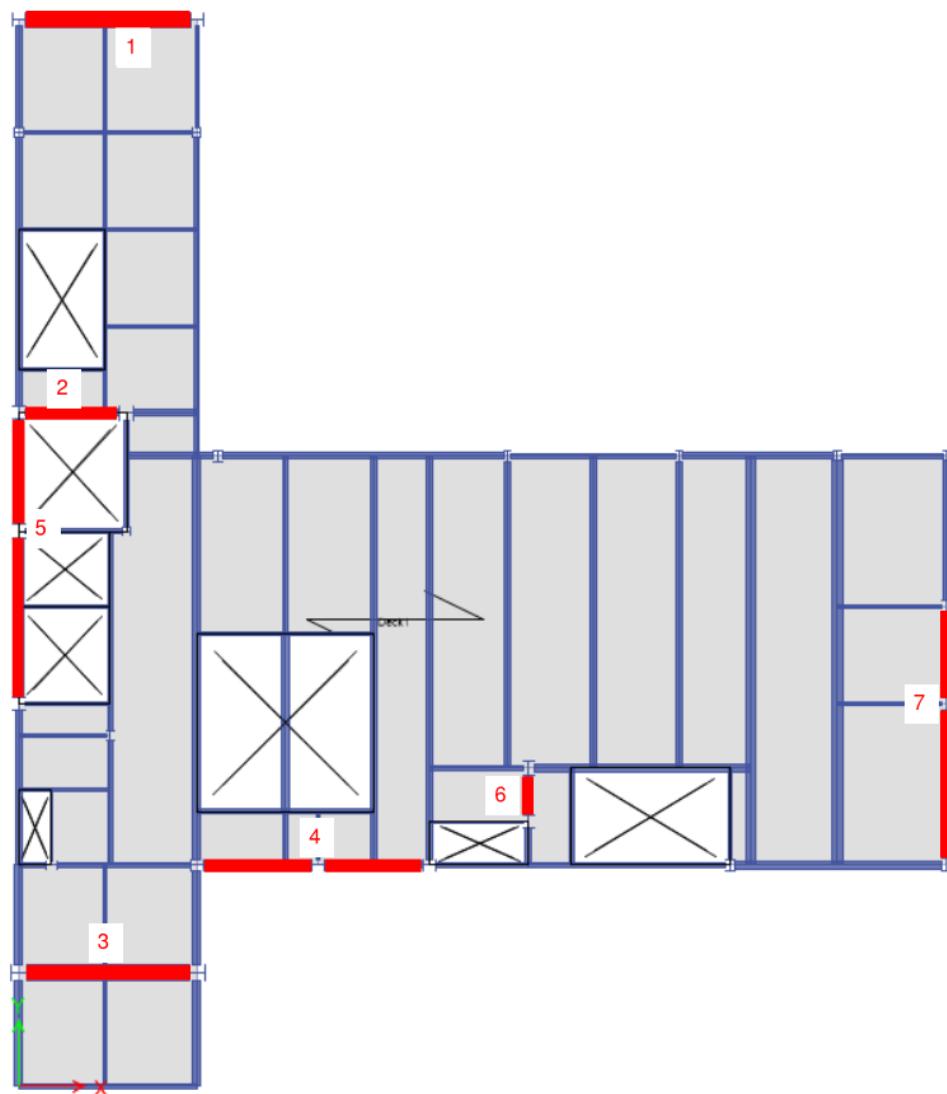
Typical Floor Plan of Lateral Resisting Elements (Fourth Floor Framing)
